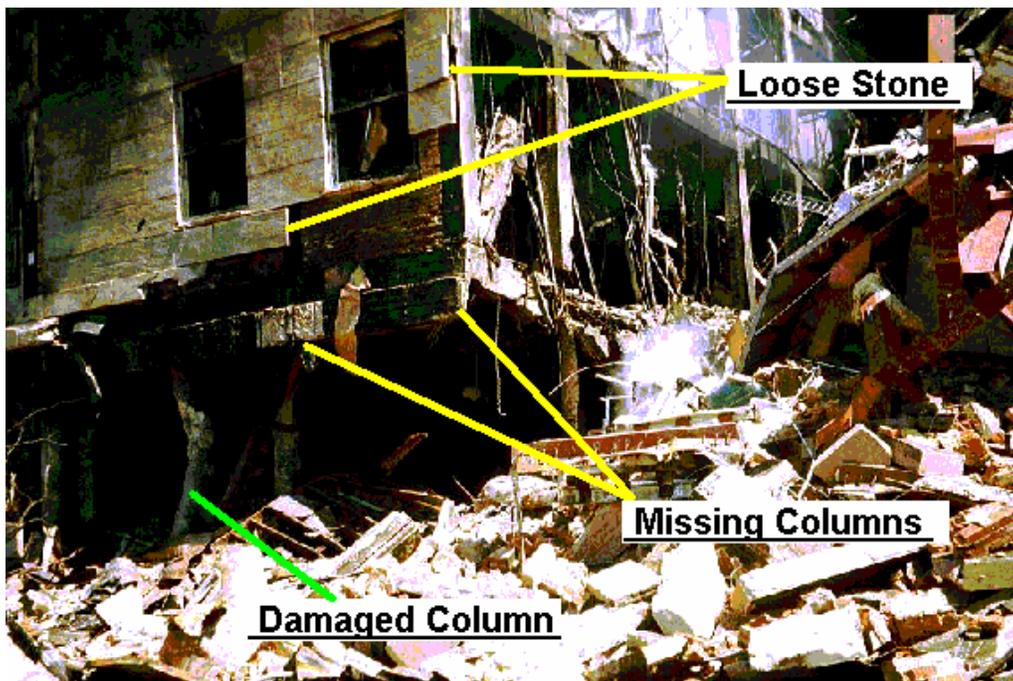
Missing Columns. The corner of the structure adjacent to the collapse was missing two columns and one was severely damaged. The section cantilevered approximately 80 feet.
